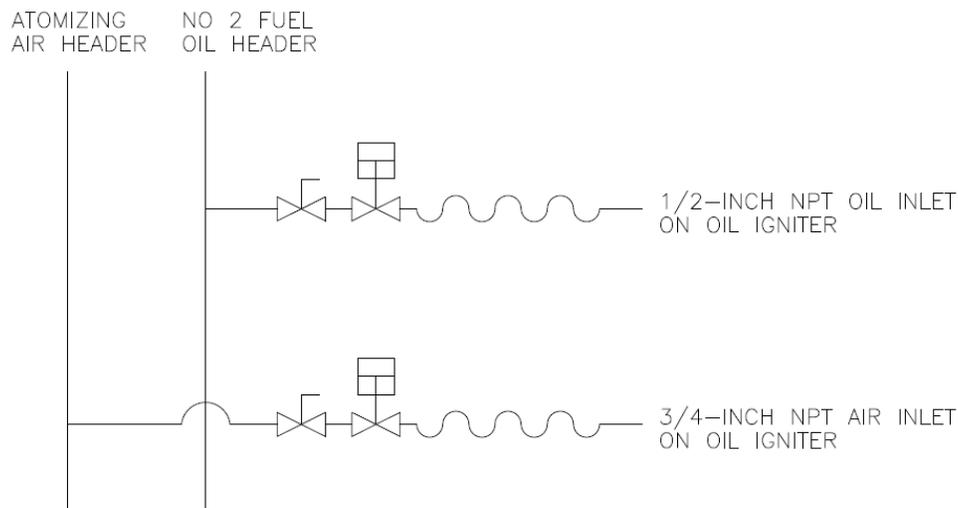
Typical Recommended Piping Arrangement for DuraFire Igniter
